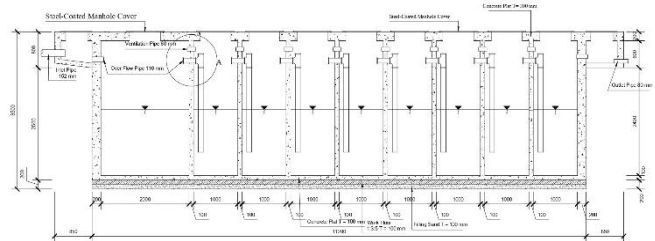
Cross-Section A-A' Technical Drawing Design of ABR WWTP
